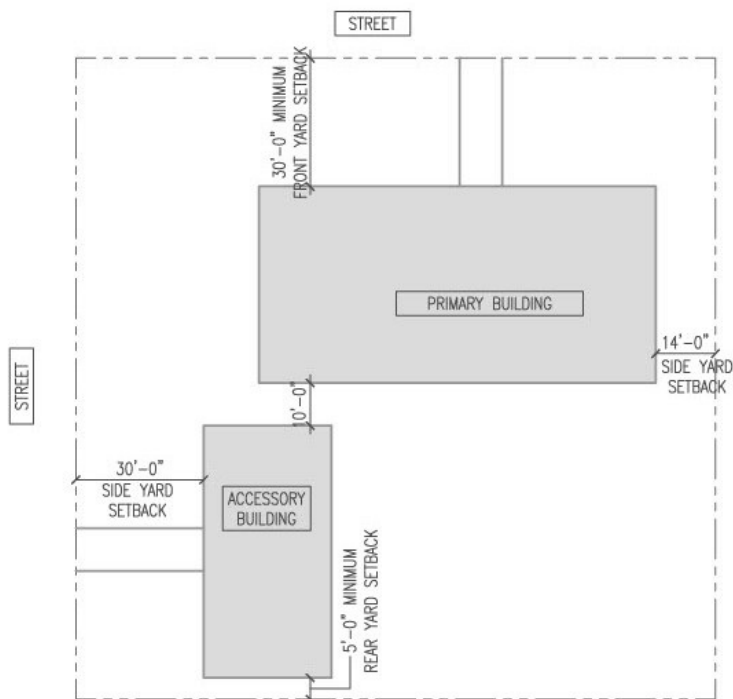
DETACHED ACCESSORY BUILDING EXAMPLE 3
